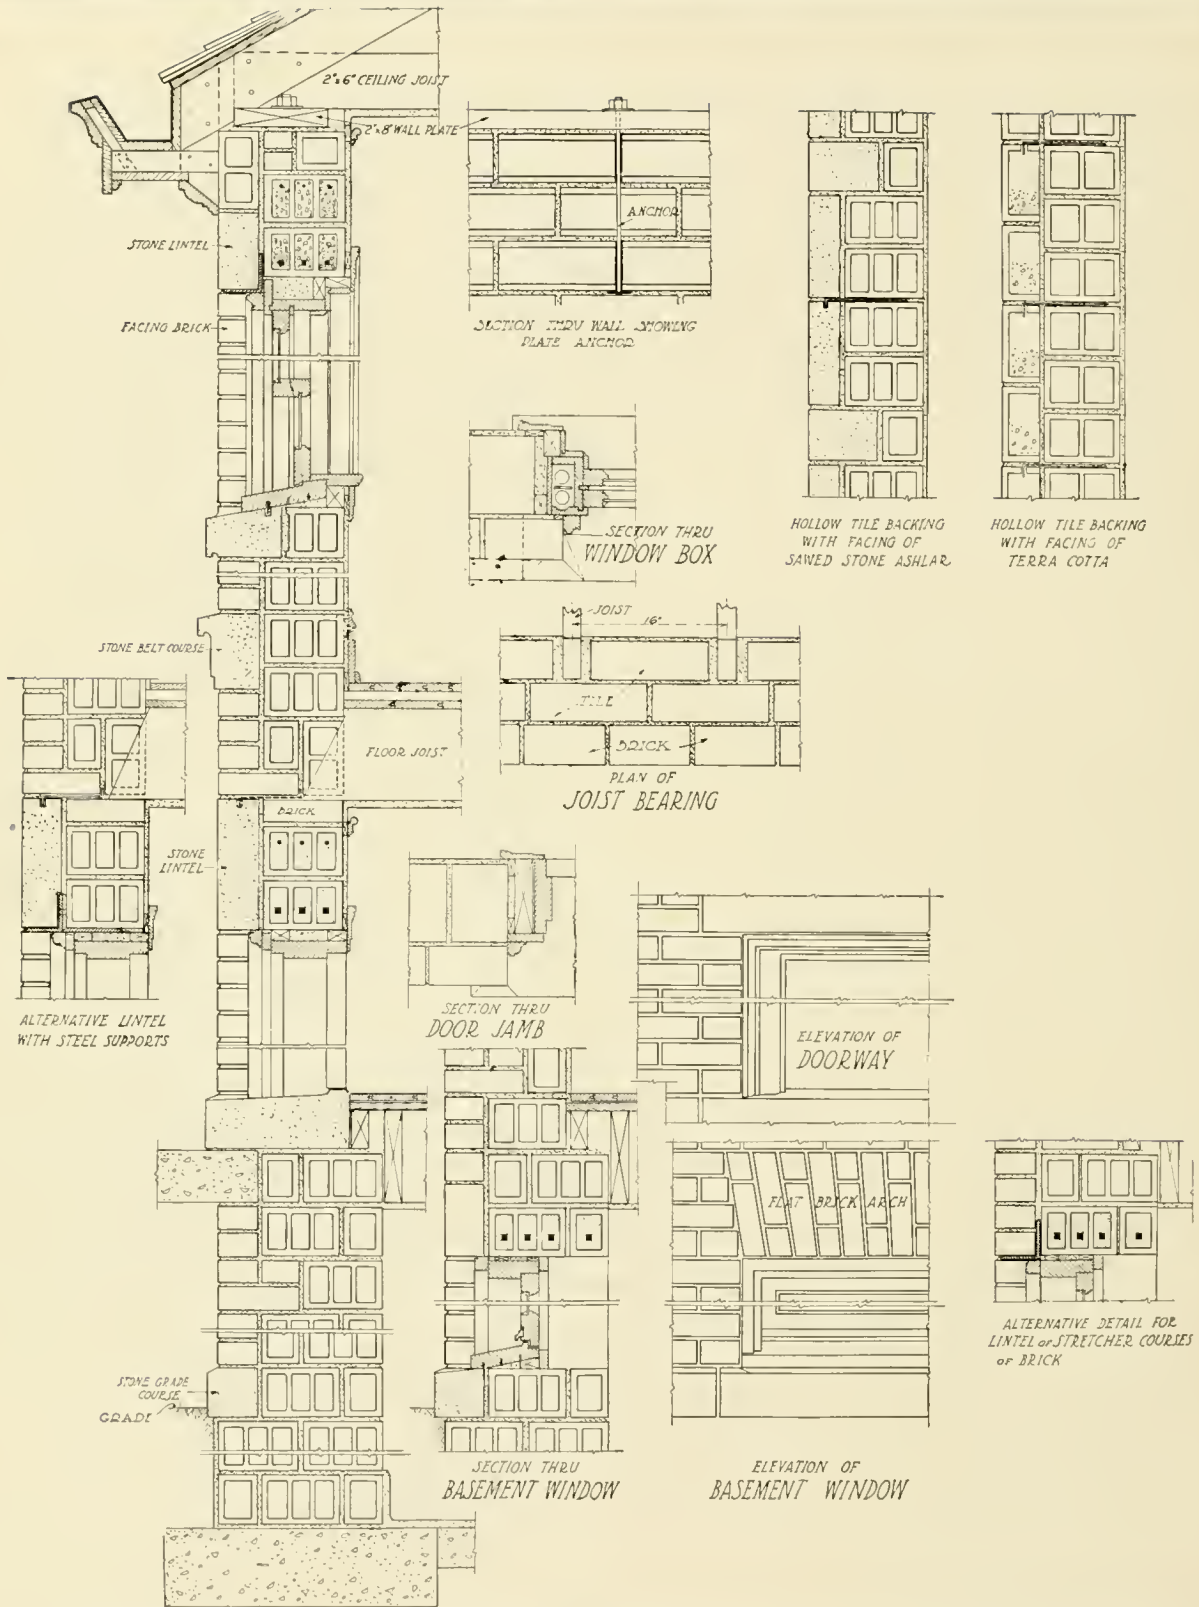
8" side construction wall with 4" brick facing. Metal bonds. For small residences and garages.
